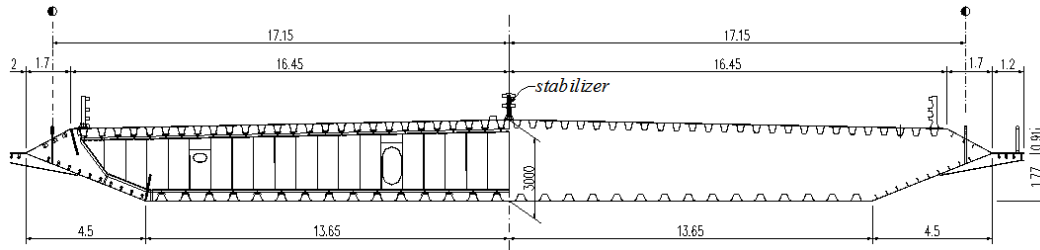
Deck cross-section of Jiangsu Runyang Bridge (Unit: m)
